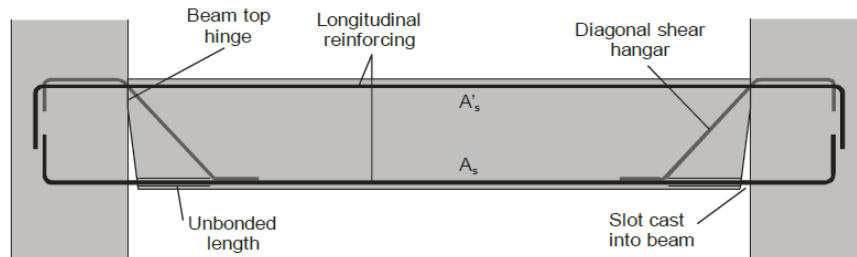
Diagram of a slotted reinforced concrete beam
